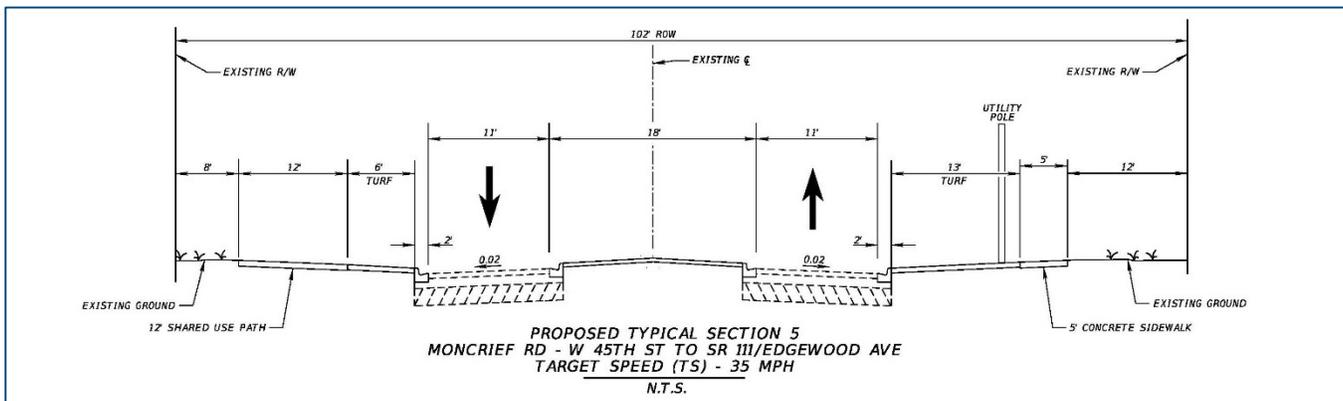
Proposed Typical Section (W. 45th Street to Edgewood Avenue)
